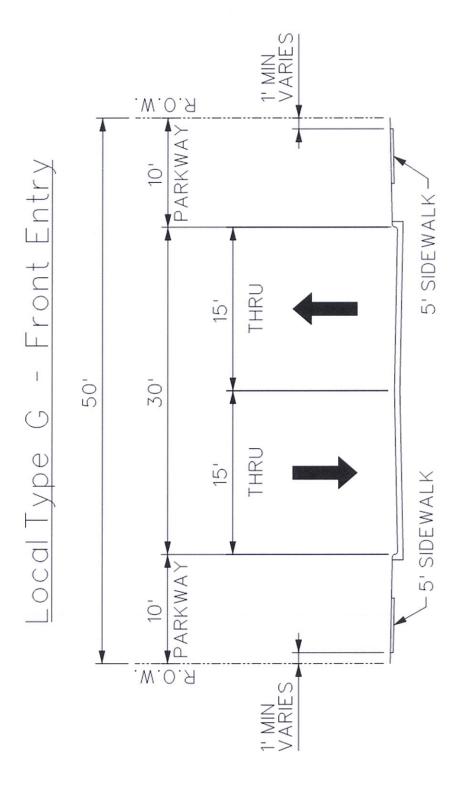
Local Front Entry Type- G Standard Construction Details Paving
